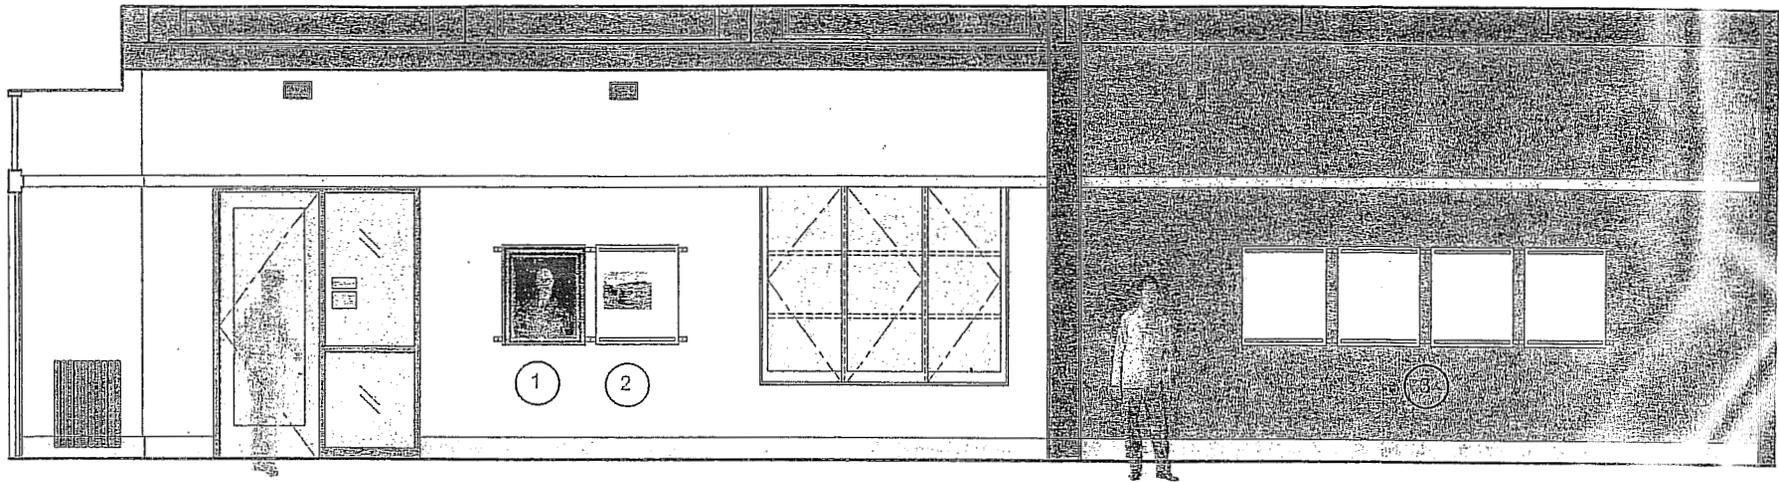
EXHIBIT C; PROPOSED EXTERIOR BUILDING SIGN
